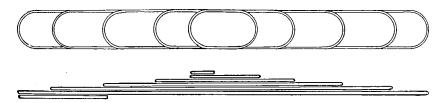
Proposed method of reinforcing a precast concrete member with a continuous loop of cold-drawn wire. Above, top view; below, side view.
